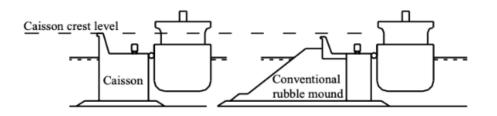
Examples of berthing facilities behind breakwaters (PIANC, 2016)
